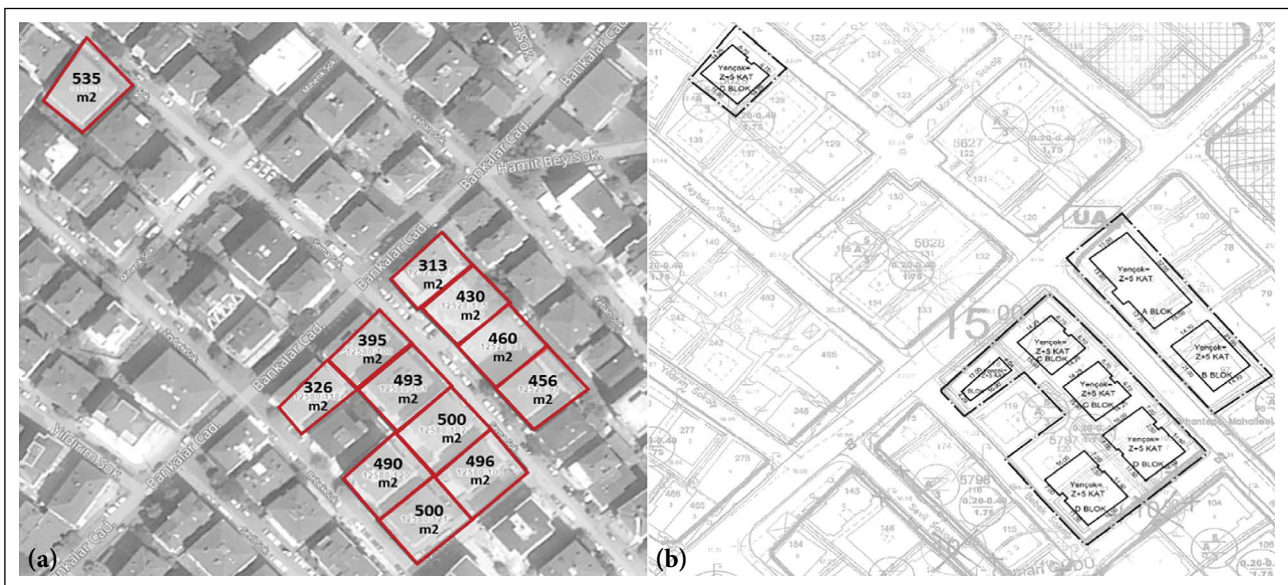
(a) The reserve building area. (b) The reserve building area plan.
